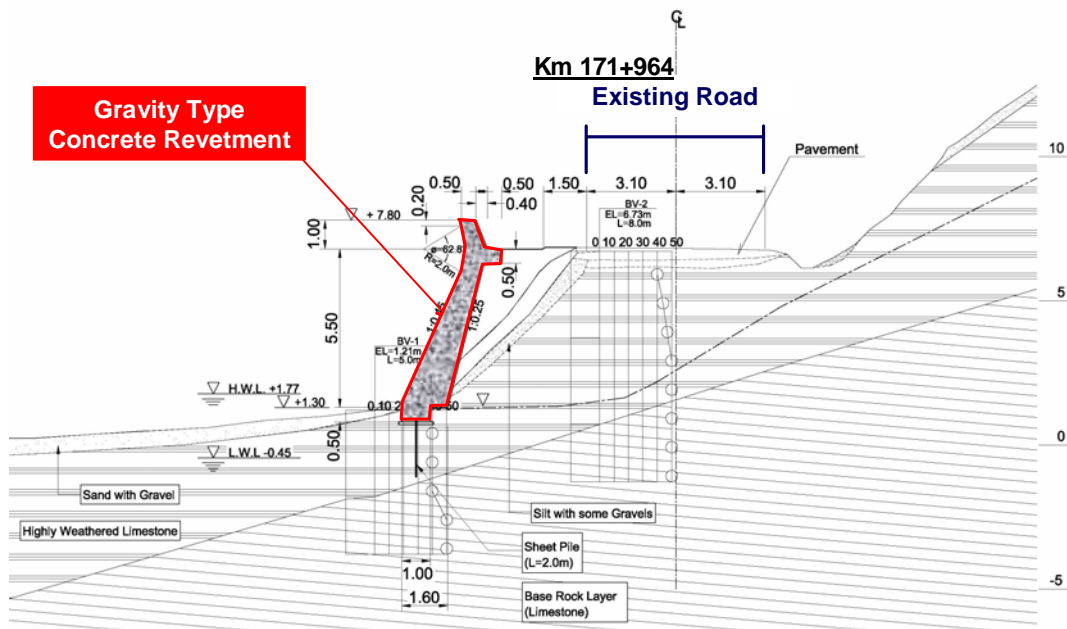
Typical Cross Section for Gravity Type Revetment
